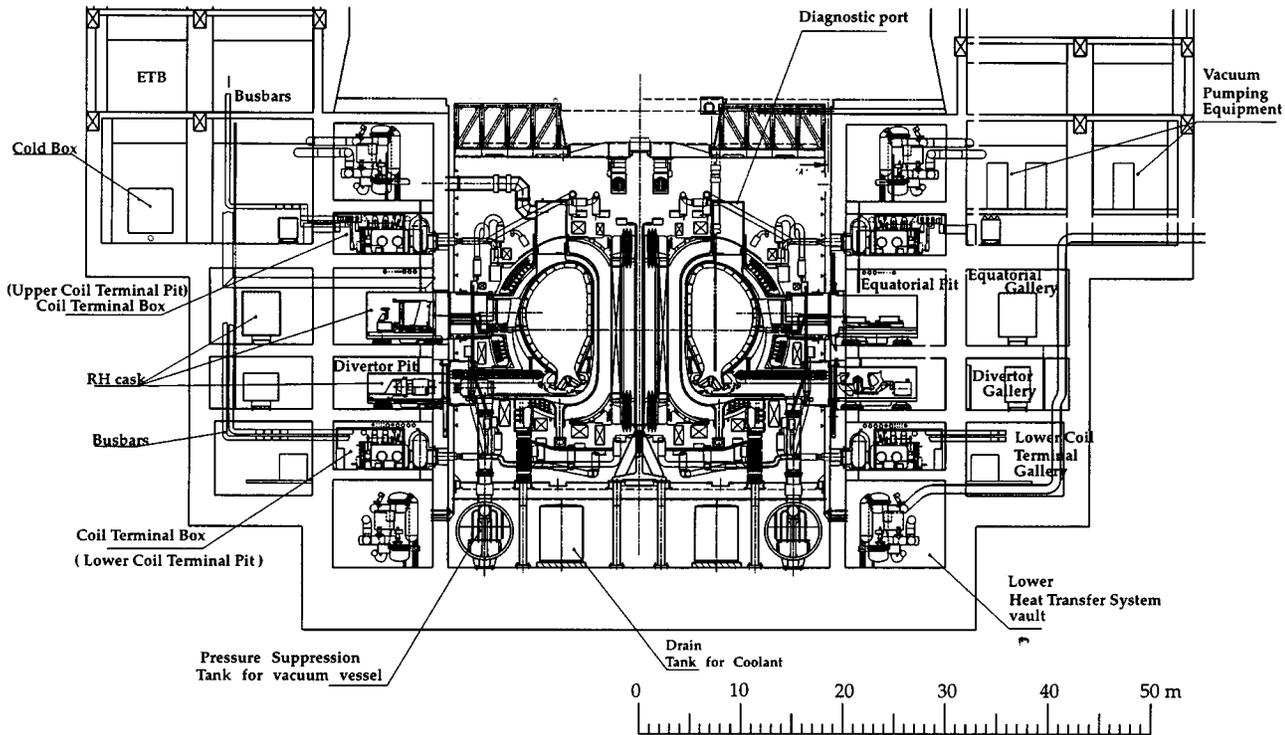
Elevation view of the equipment layout. RH: remote handling.
